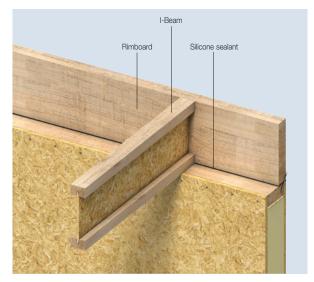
Locating and Fixing Rimboards for First Floor Deck
